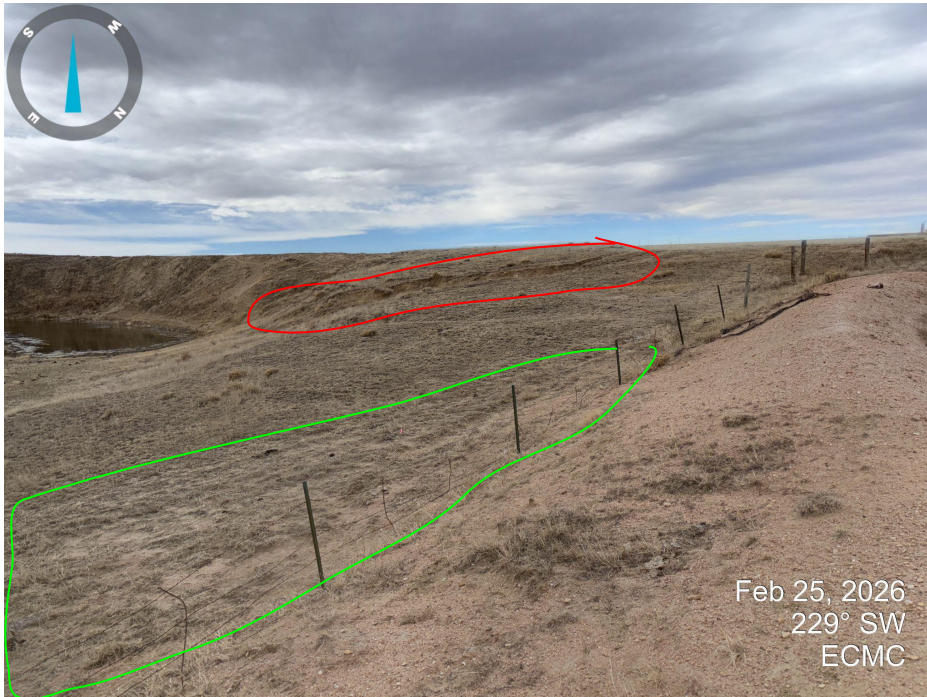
Photo taken from the southeast corner of the southern pit looking towards the tank battery area. A stormwater erosion channel travels off the tank battery pad down towards the pond (red circle). Downgradient of the pit, vegetation appears to have less coverage than surrounding areas (green circle). This area does appear to be stabilized by perennial vegetation at the time of inspection.
